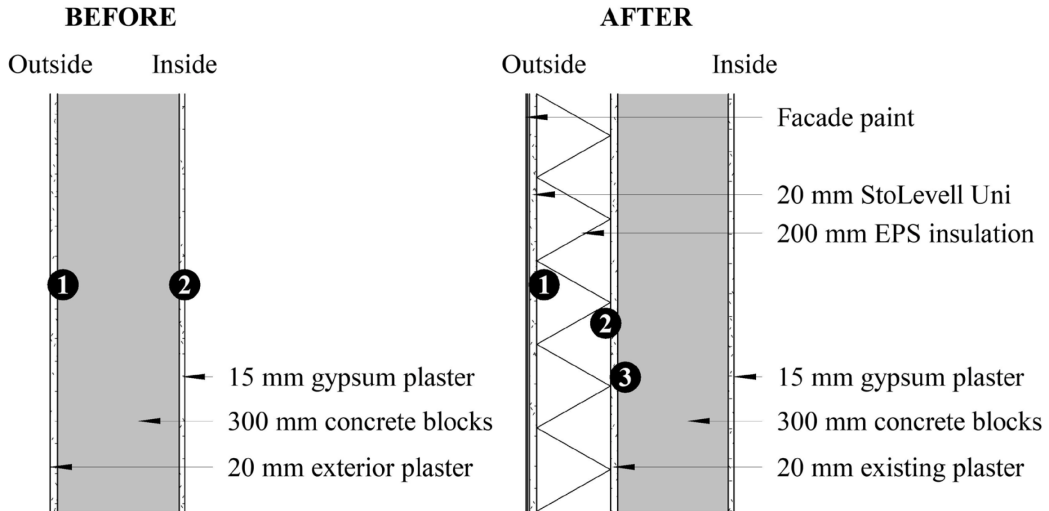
Plan section, exterior wall construction, initial and retrofitted state.
